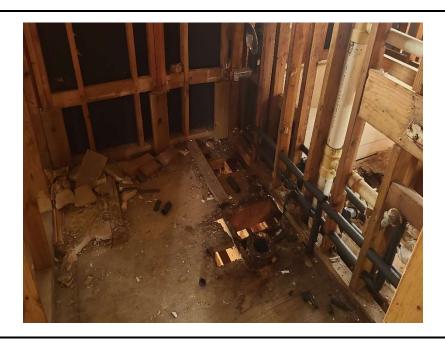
Rotton plywood and framing members below in upstairs bathroom
